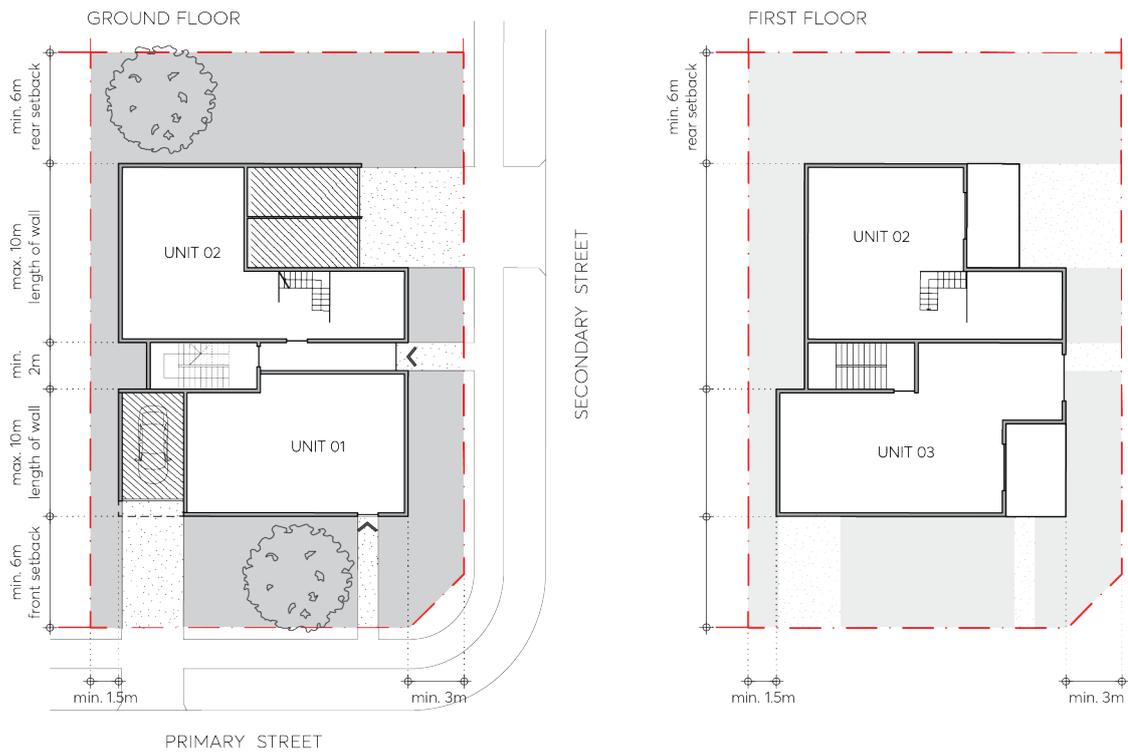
Site setbacks for manor houses on a corner lot
